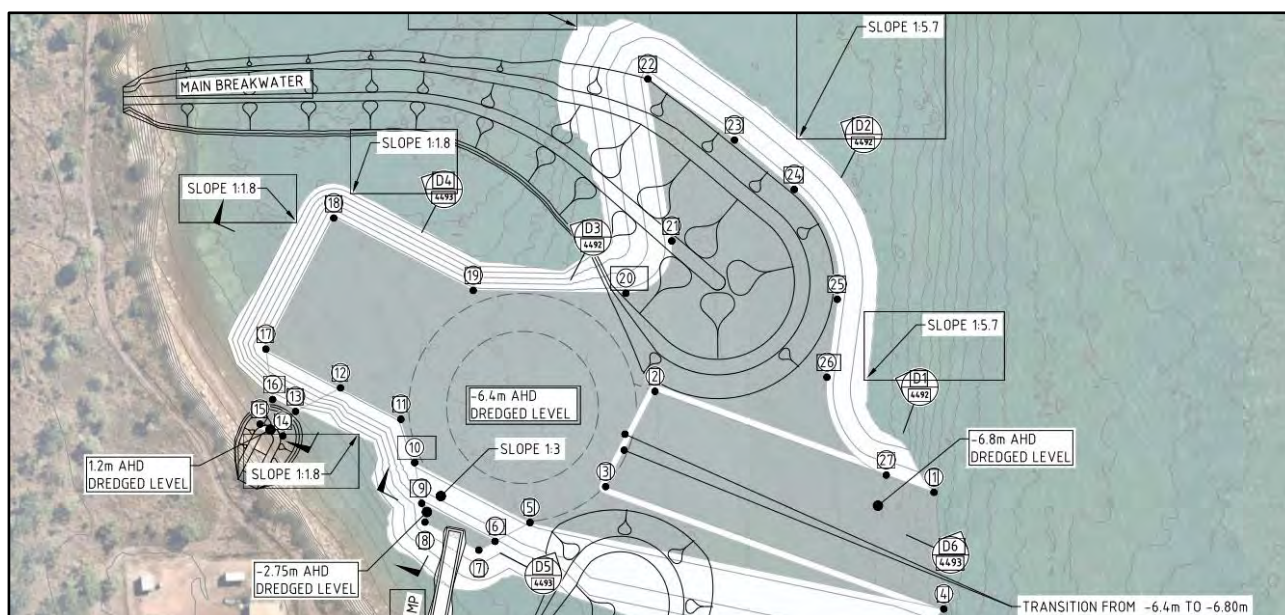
Dredge layout (extract from design drawing R21-4491)
